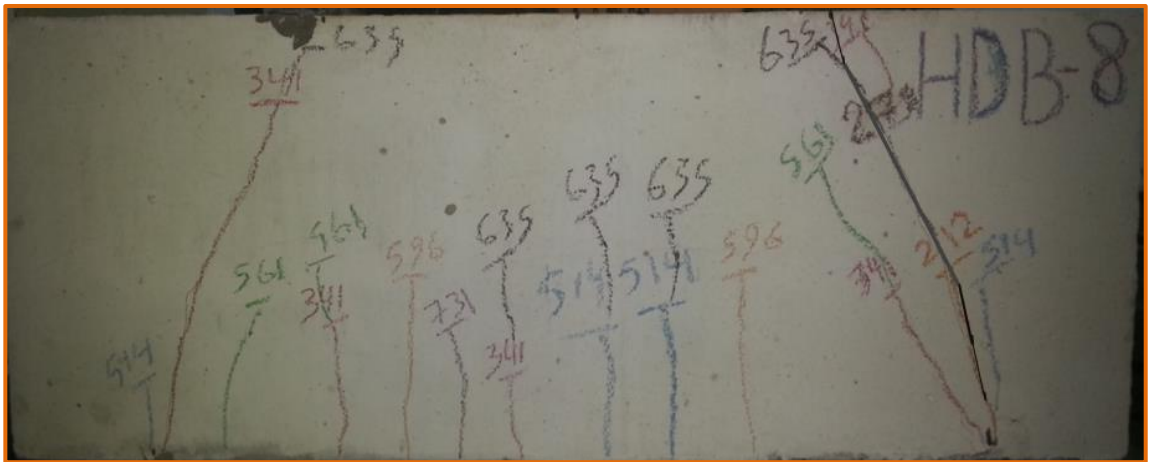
Crack pattern of hybrid deep beam HDB-8 at failure.
